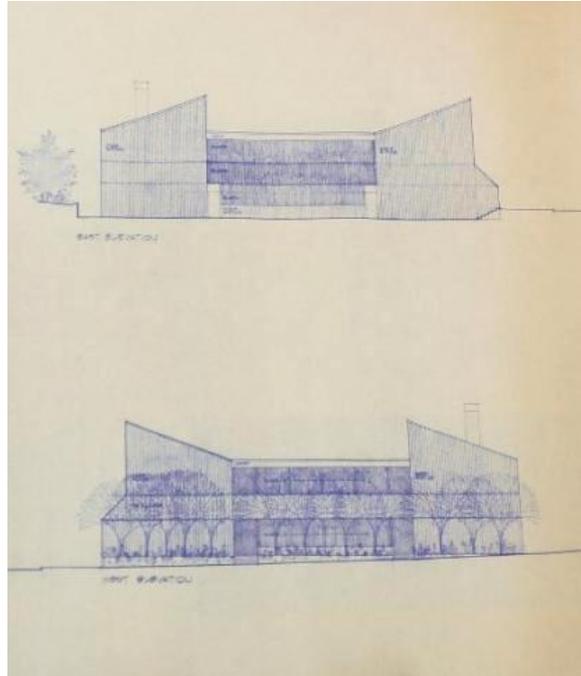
Plan for “B Building,” Wong and Brocchini, 1973. Source: CCA Facilities Department.
